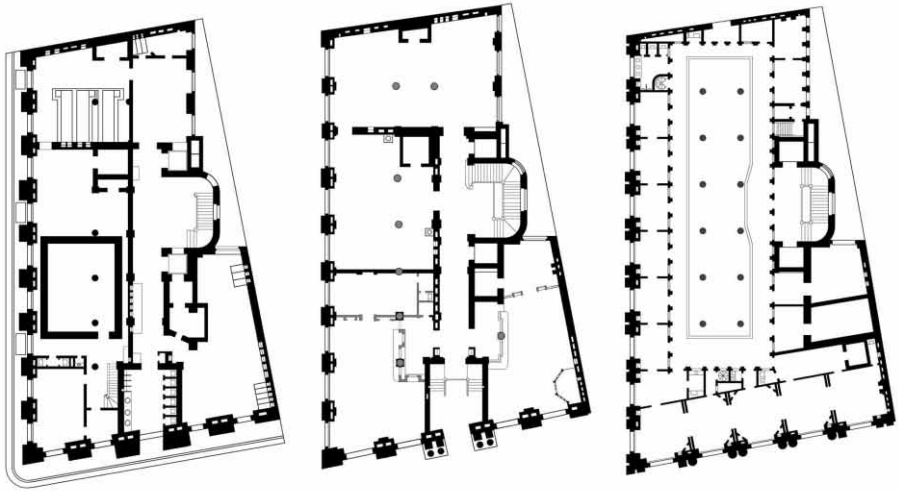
Cellar, first floor and second floor plans, Equitable Life Assurance Society Building, New York City, designed by Arthur Gilman, Edward Kendall and George Post, 1870
